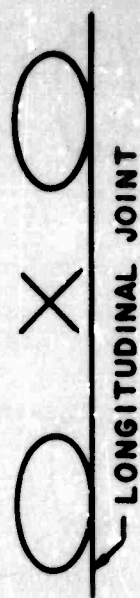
Wheel Positions 5-8 for Twin-Tandem Static Load Tests, Rigid Pavement Test Section
